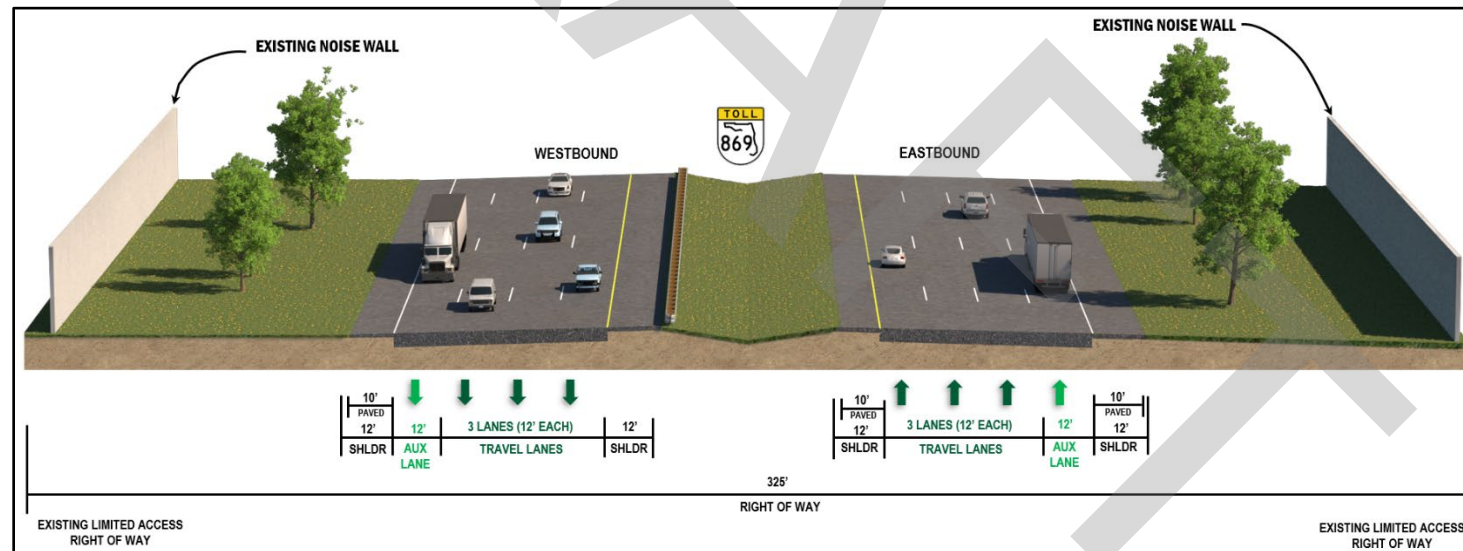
Existing Roadway Section between US 441 and Lyons Road
